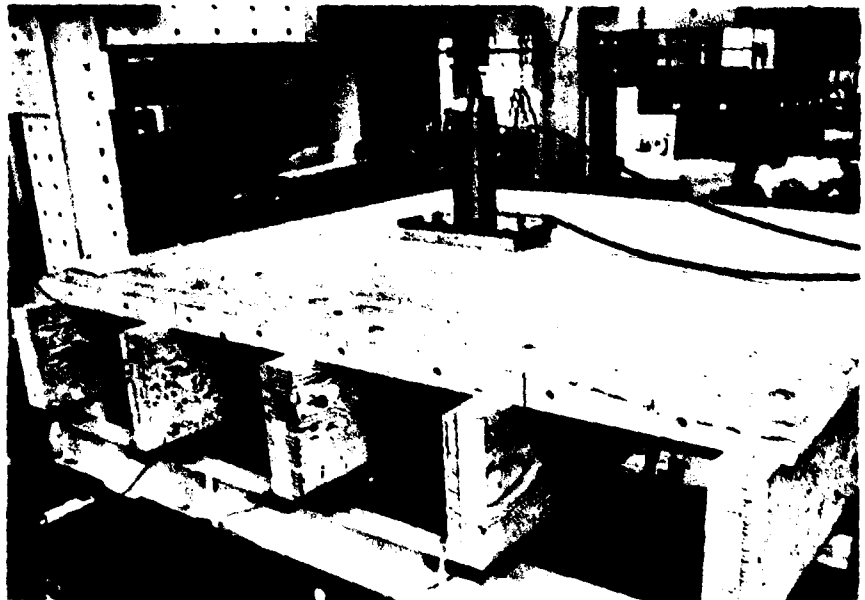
Series 2 test setup for 3 $\frac{1}{2}$ -inch-thick Press-Lam bridge deck attached to stringers 2 feet apart on an 8-foot span.
